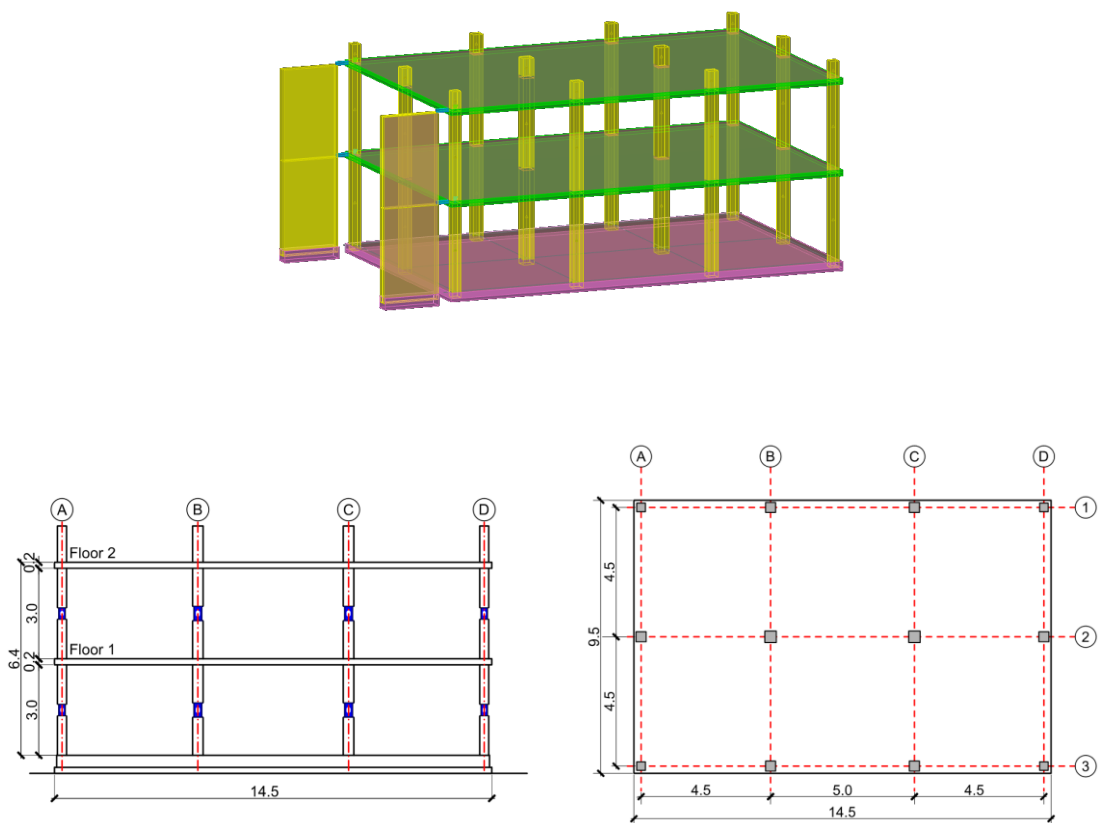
(a) 3D scheme of the building; (b) geometry (units m).
